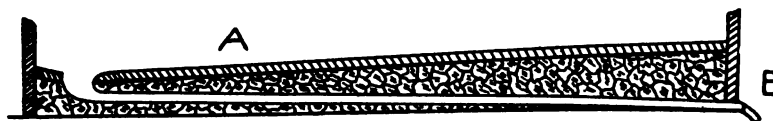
A—FLOOR RUBBING DECK. B—DRAINAGE PIPE.
